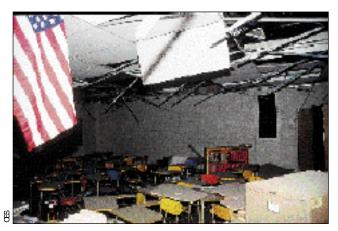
Though falling acoustic ceiling tiles like this are not particularly dangerous, falling light fixtures and other heavier elements can be.
